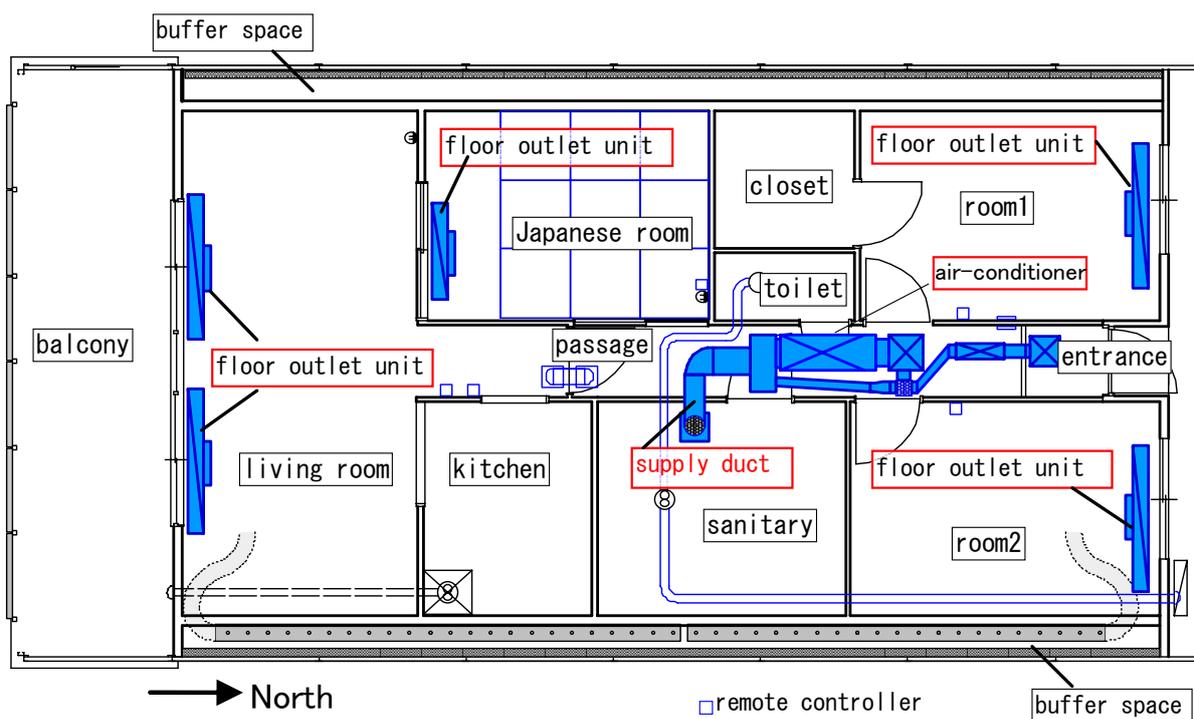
NEW CENTRAL AIR-CONDITIONING SYSTEM FOR JAPANESE CONDOMINIUMS
